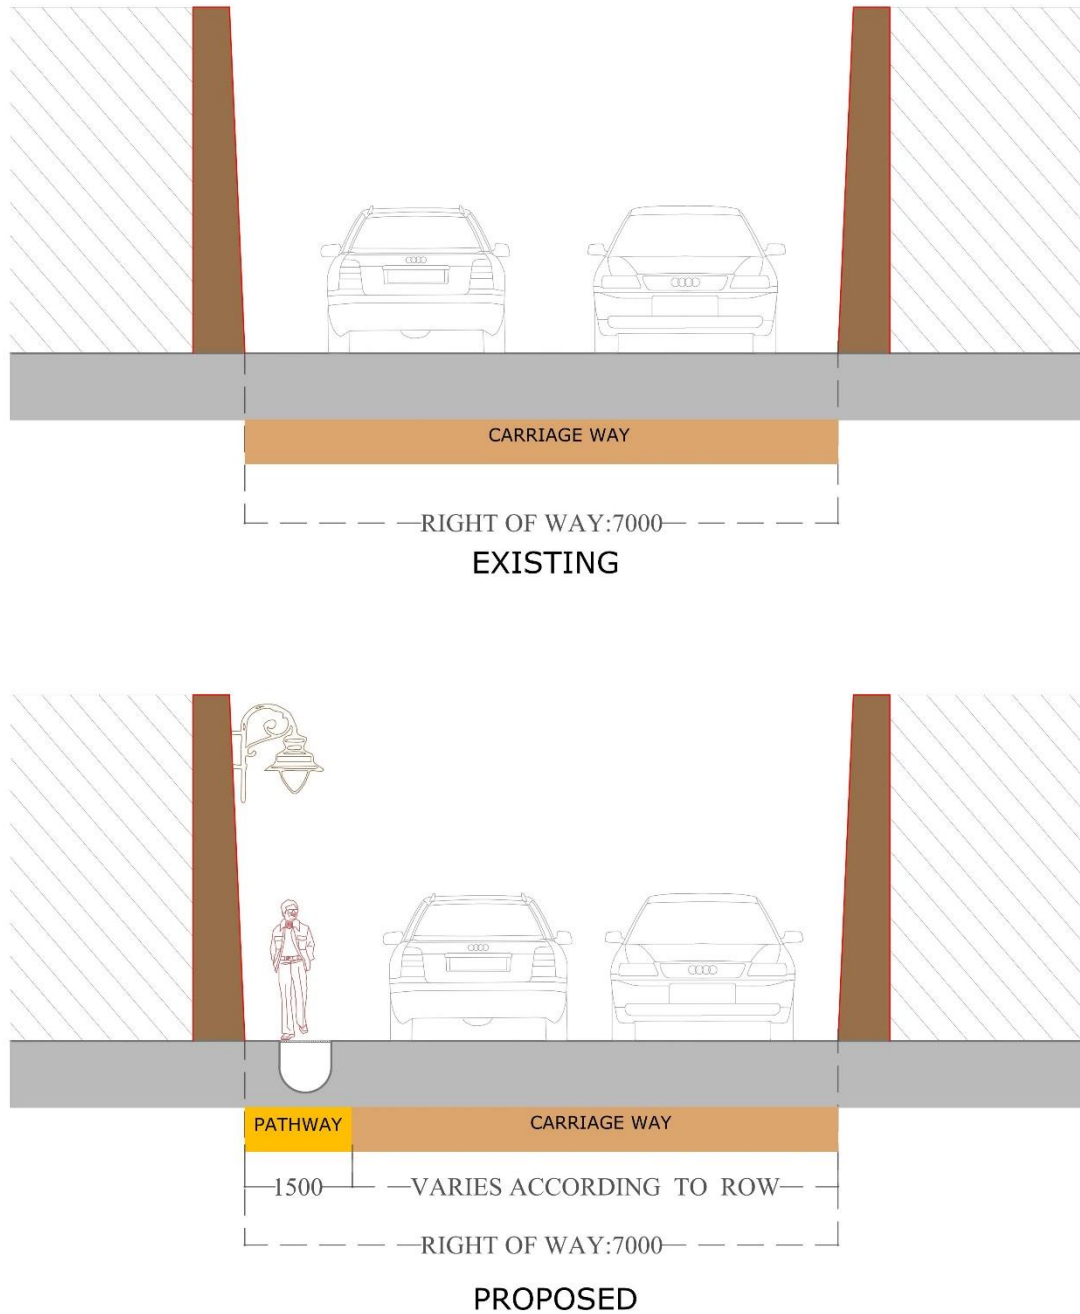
Existing and proposed section AA of Zenana mahal stretch
